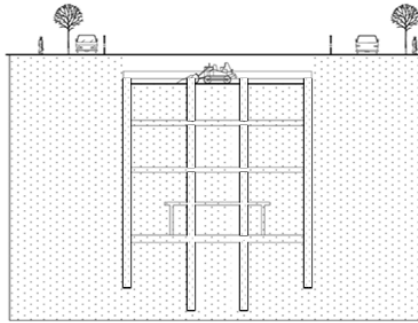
Eliminating the surface loads and the surface soils on the top of the diaphragm walls
